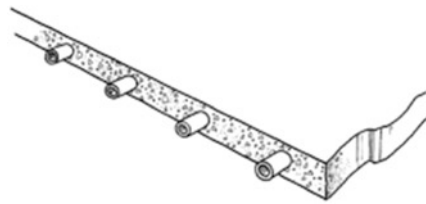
A detail of floor slab, ventilated with PVC pipes. The slabs may have channels for air circulation for cooling the house. These channels must have entry and exit to the outside so that air can circulate and be renewed. Openings must be protected against the entry of insects
